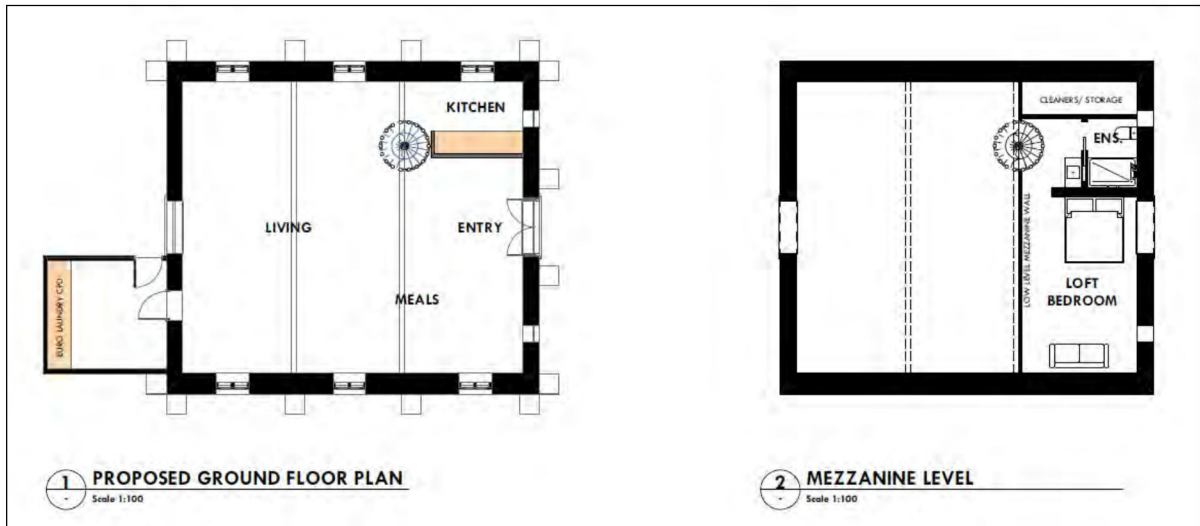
Proposed renovation to church – floor plan (Source: Phase Building Design 2024).
